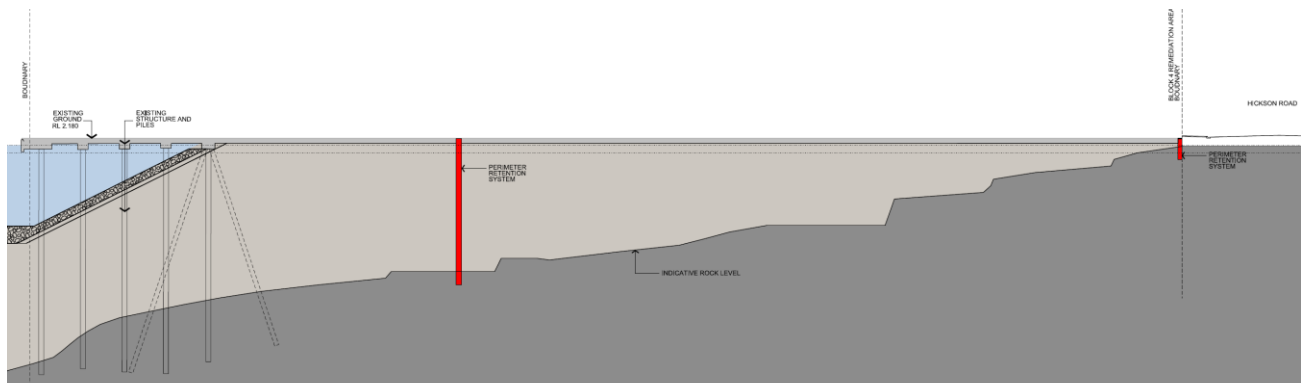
Approved extent of Block 4 retention wall system (Section 1 – not affected by proposed modification)
